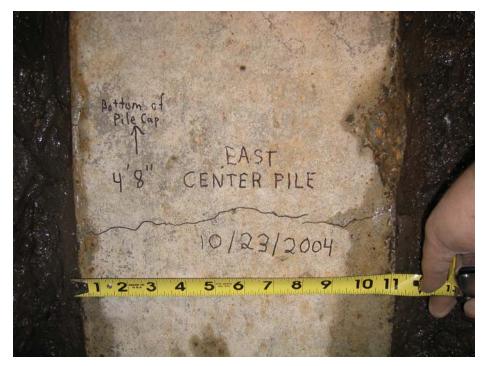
East abutment center pile excavated for crack exploration
